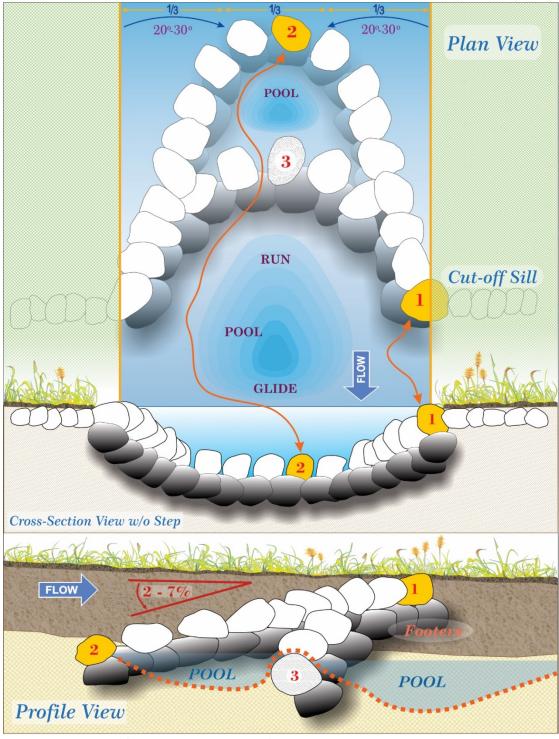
Plan, profile, and section views of the Cross-Vane design.
